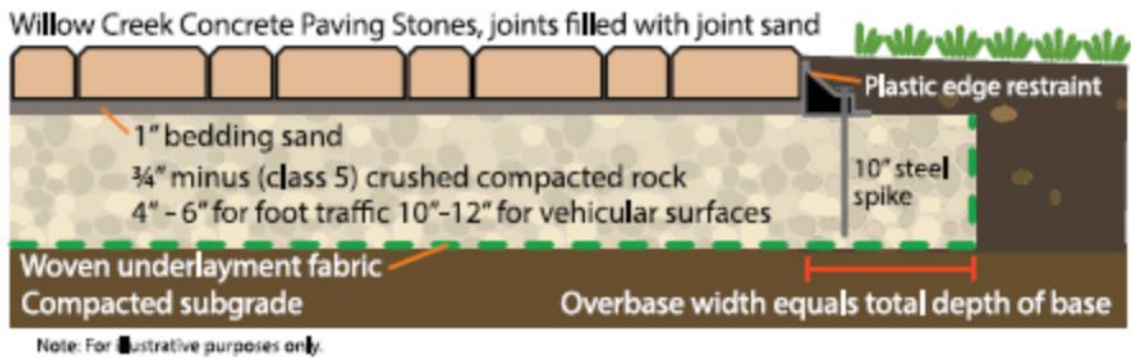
Example of an installation method for stone pavers (Willow Creek, n.d.)
